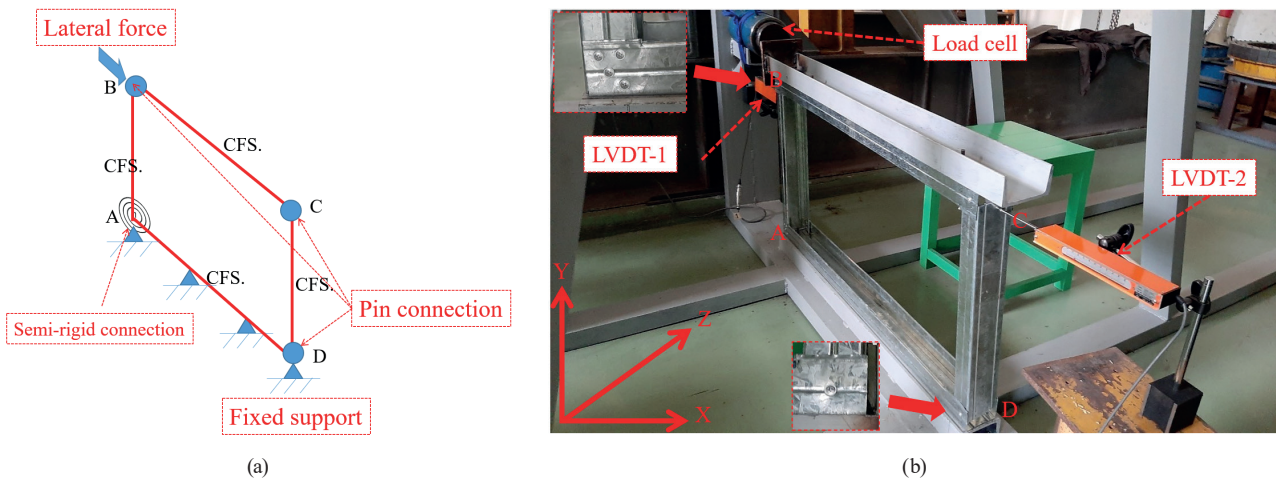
Connection test, (a) CFS-wall connection test schematic, (b) Connection test set-up
